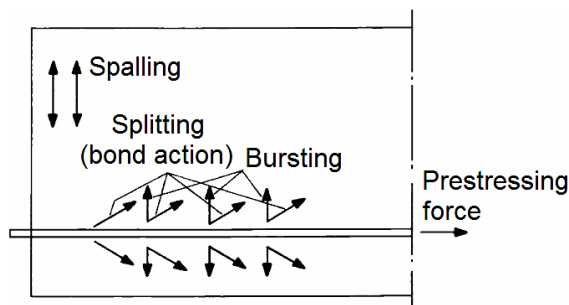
Bursting, spalling, splitting in the anchorage zone of a member, prestressed with steel with direct bond
